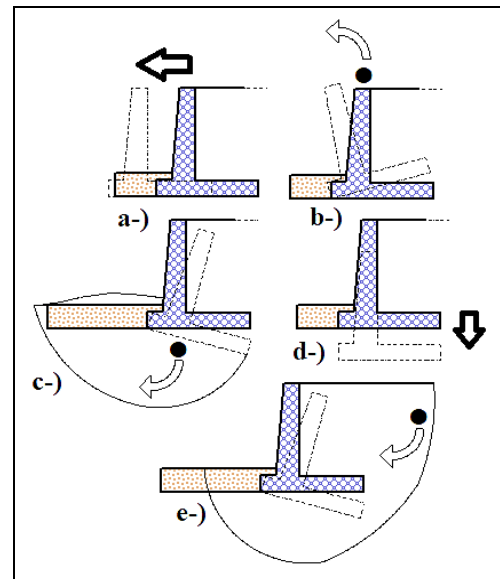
The possible failure conditions of retaining wall. (a): Sliding. (b): Overturning. (c): Bearing capacity. (d): Settlement. (e): General failure.
